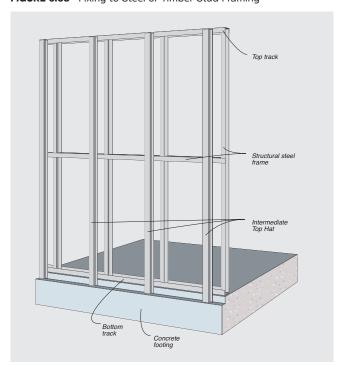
Fixing to Steel or Timber Stud Framing
